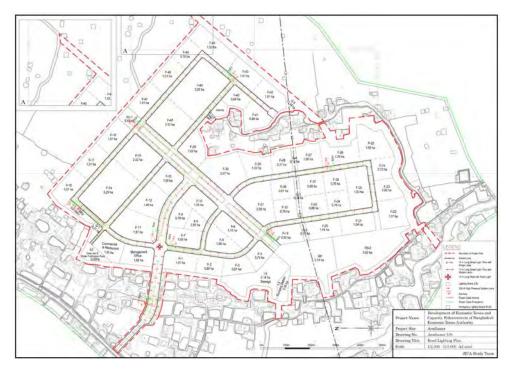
(4)-13b Araihazar road lighting plan
